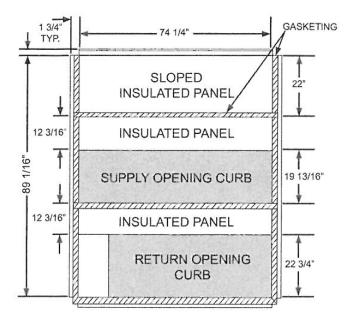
Plan View of Existing Curb Used with CRADCURB005A00
